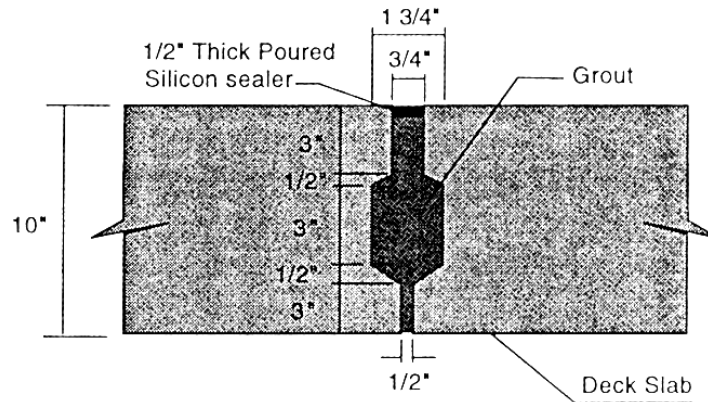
Female-to-female joint for bridge deck panels (Ref 8)
